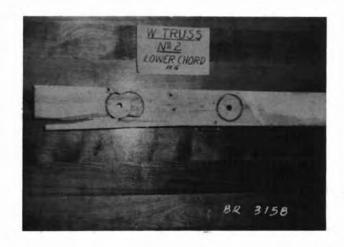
Failure in lower chord member of W-truss No.II, bottom view of member
